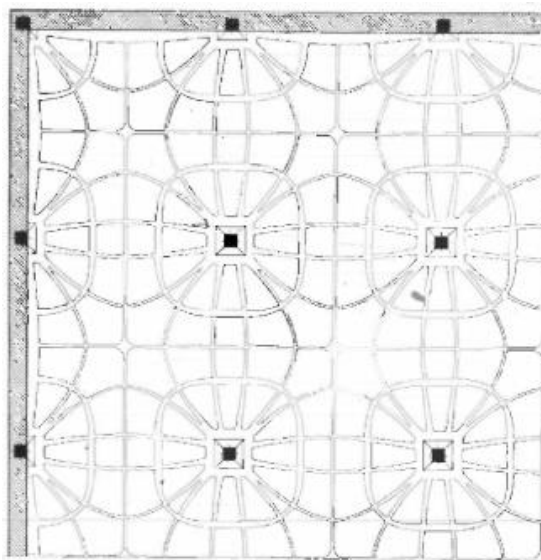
2. Gatti Wool Factory's Roof plan (Source: Nervi, 1965, p.66)
